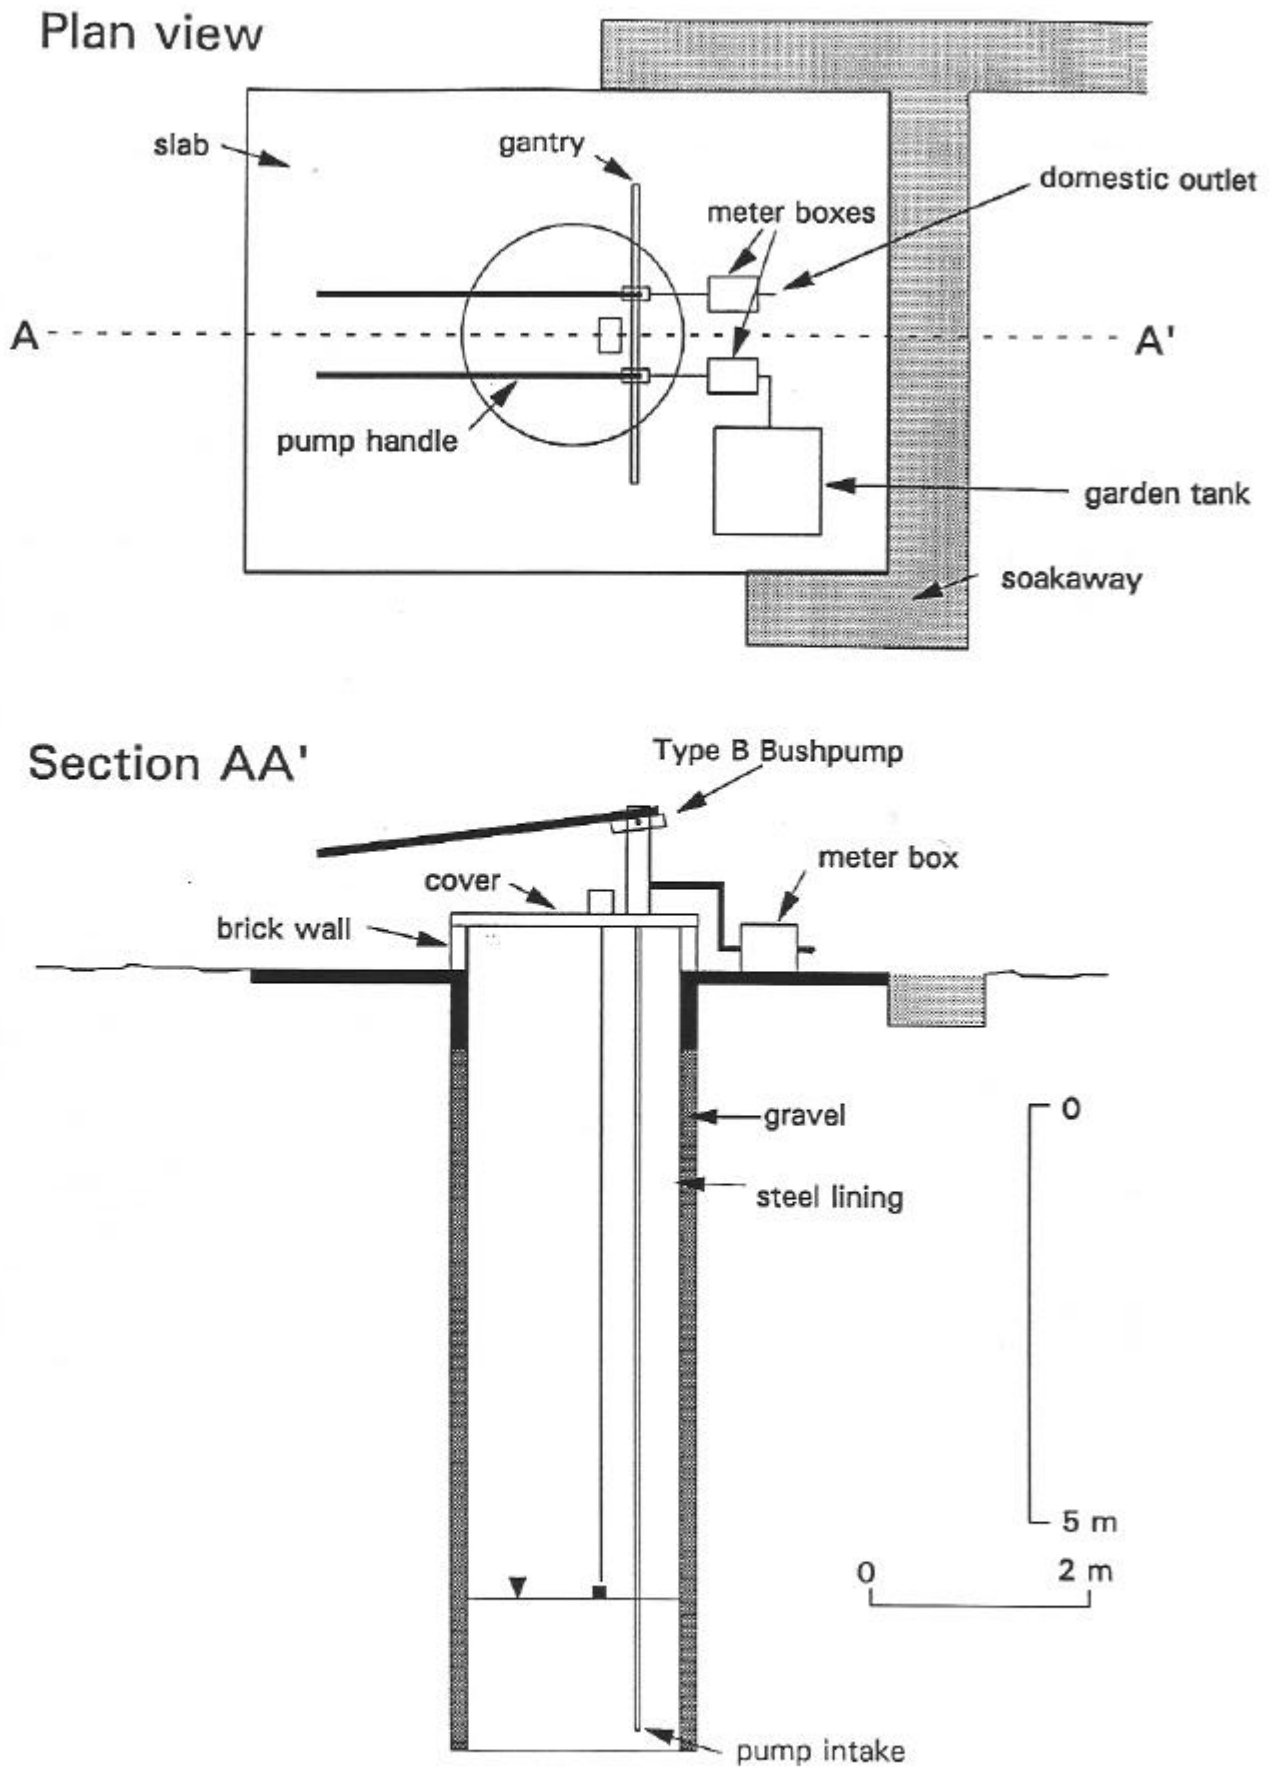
Collector well and headworks construction, site 7, Machoka
